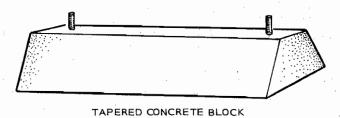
TYPICAL MOUNTING FOUNDATION (SMALLER UNITS)
